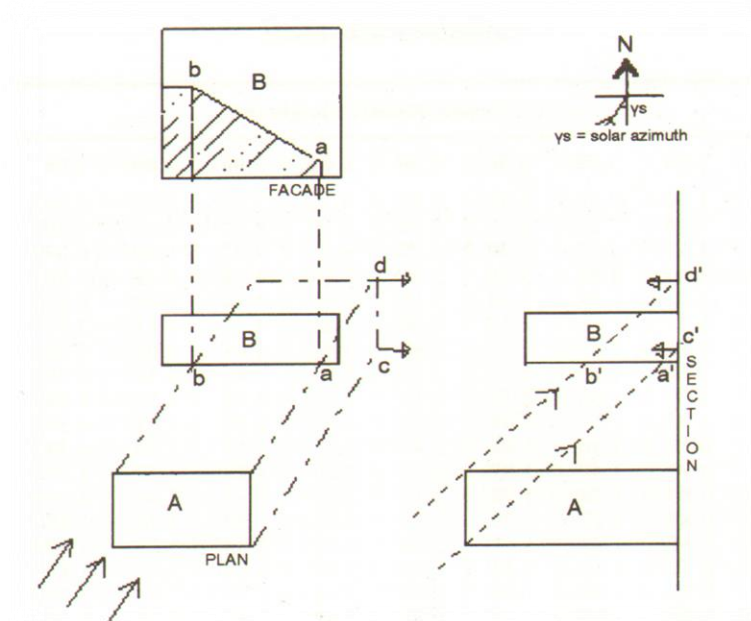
Identifying the shading pattern of neighbouring buildings in plan and section.
